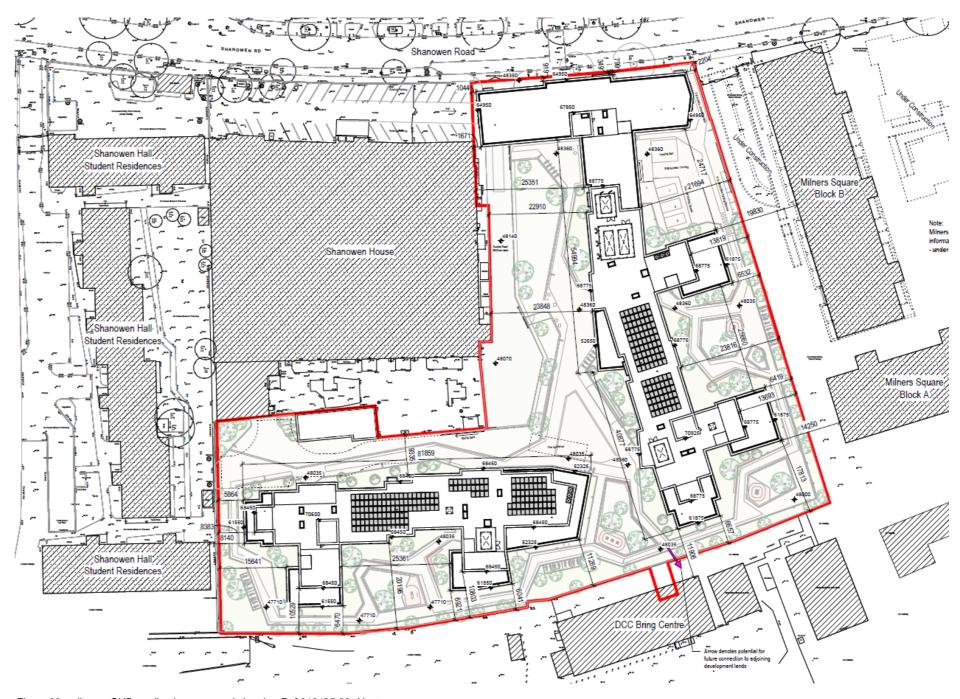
adjacent SHD application proposed site plan Ref.313125-22, Nest
